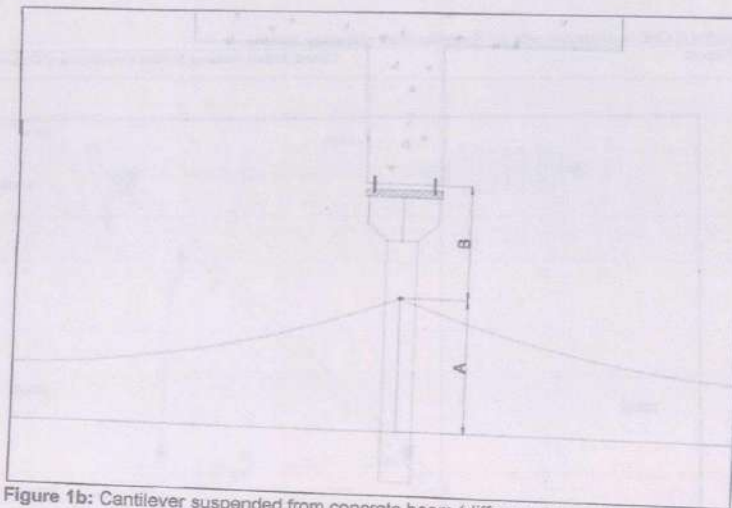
Cantilever suspended from concrete beam (different fixing arrangement)
